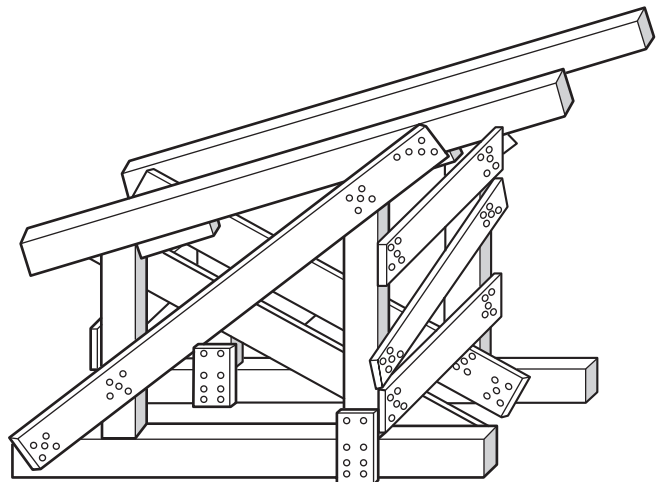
(d) Sloped Floor Shore Type 3.
